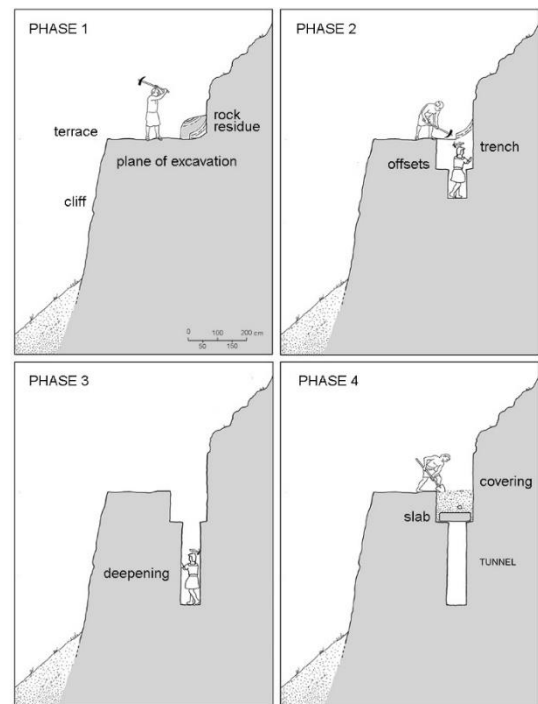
Reconstruction of the excavation technique of the trench of Ahlat, lake Van, eastern Turkey (drawing R. Bixio)
